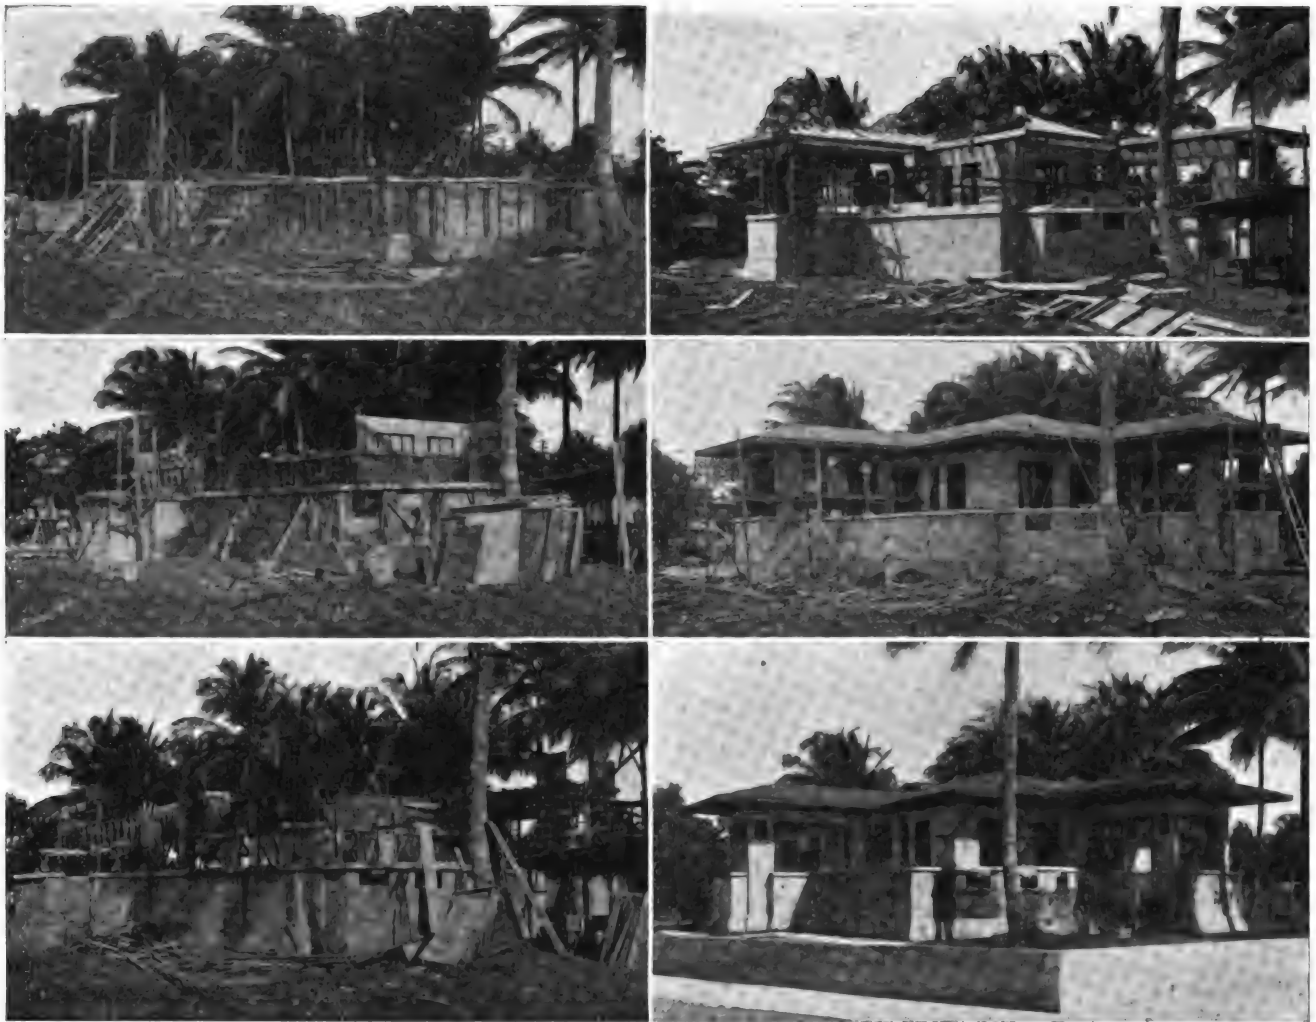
CONSTRUCTION VIEWS OF HOUSE FOR BEHN BROS., EL CONDADO, PORTO RICO
